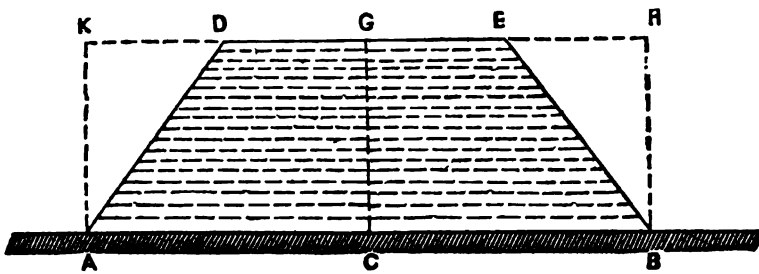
is a cross section of an embankment made on ground which is level, or slopes only in the direction of the road only.
